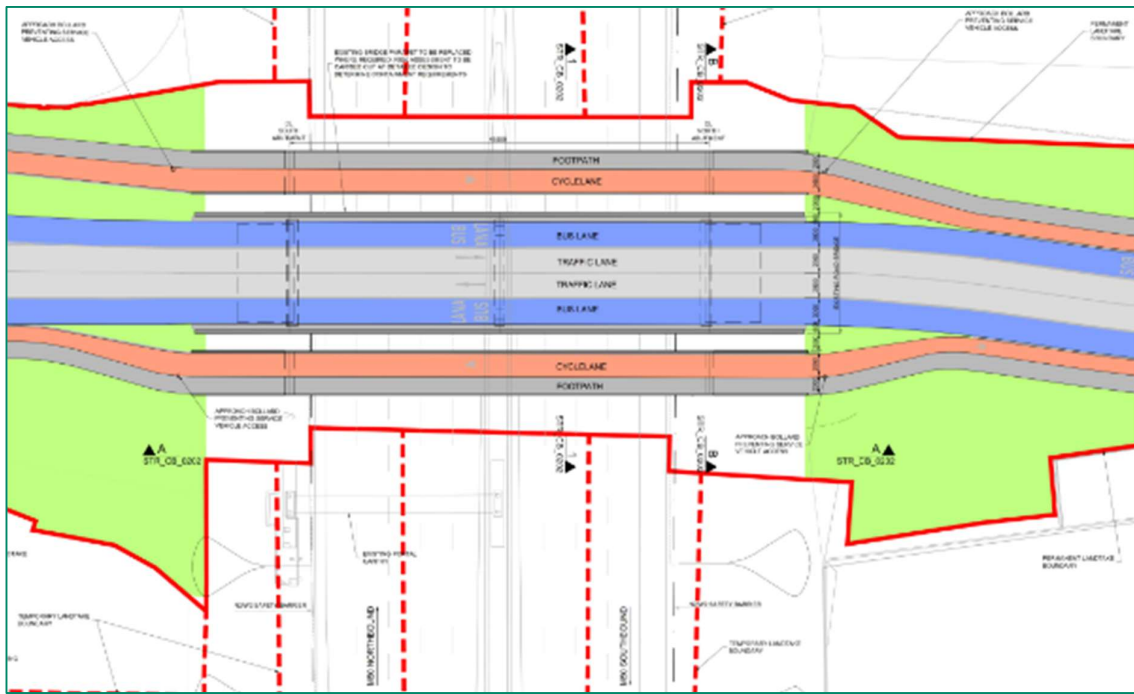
Extract of Bridges and Major Retaining Structures Drawings at R819 Greenhills Road interface with M50 – Plan View
